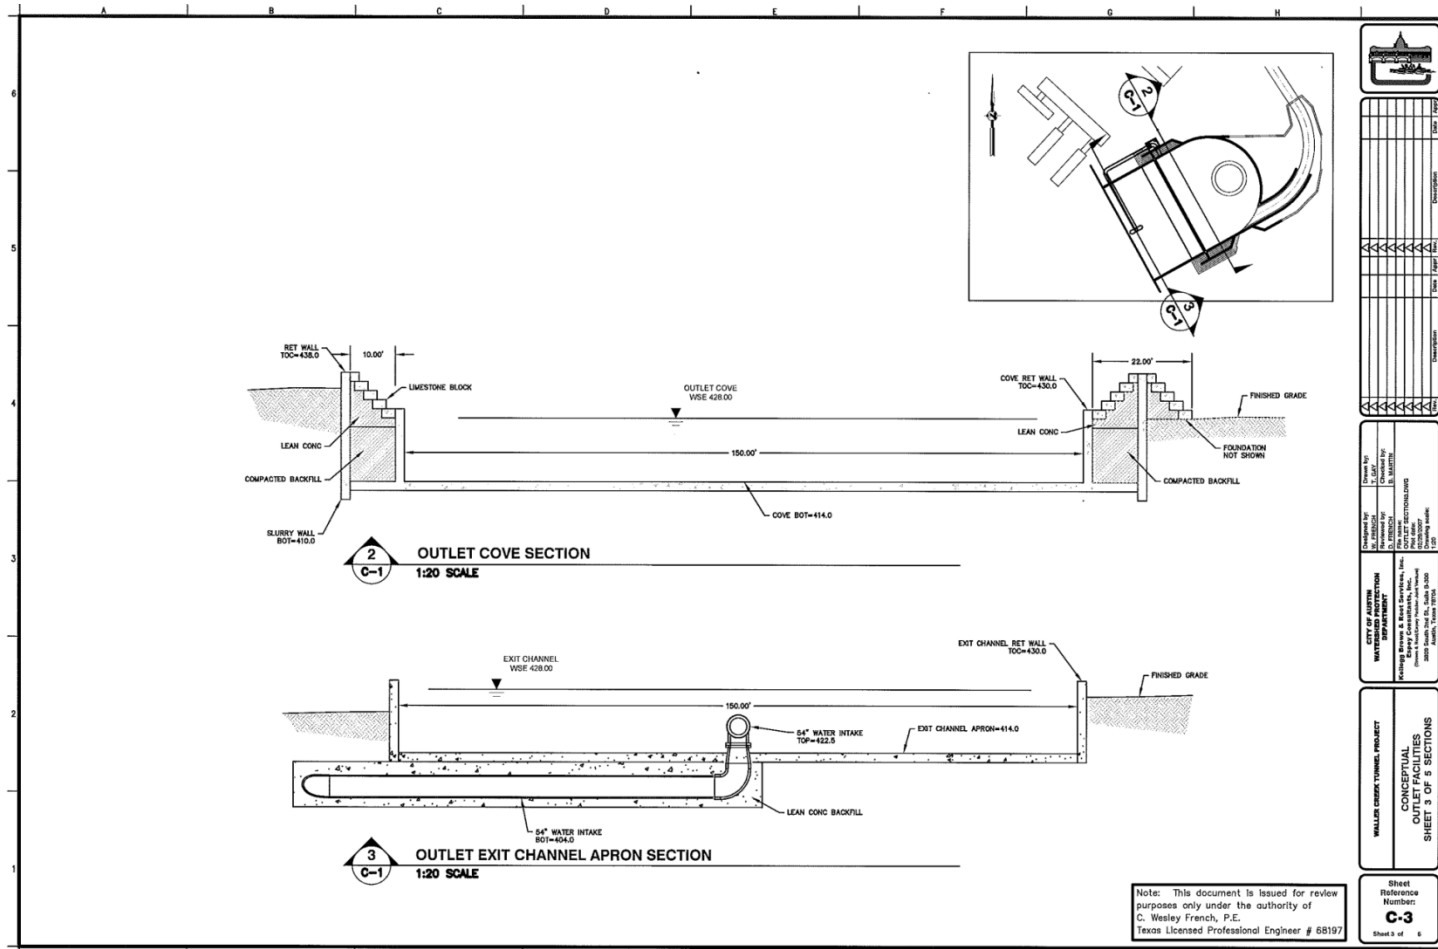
Waller Creek Tunnel Project; Outlet-Section
